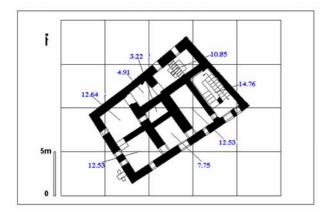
The dimensions (in m<sup>2</sup>) of rooms in the West House at Akrotiri (ground floor plan).
